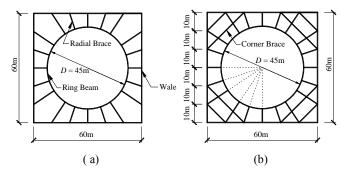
Two horizontal bracing systems: (a) Ring beam and radial support system without corner bracing; (b) Ring beam and radial support system with corner bracing
